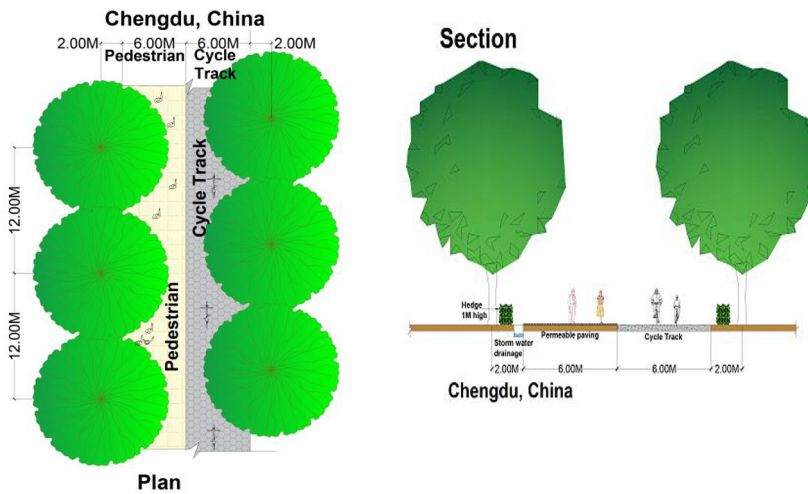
Typical plan & section of a road in Chengdu. Source: - Author’s
